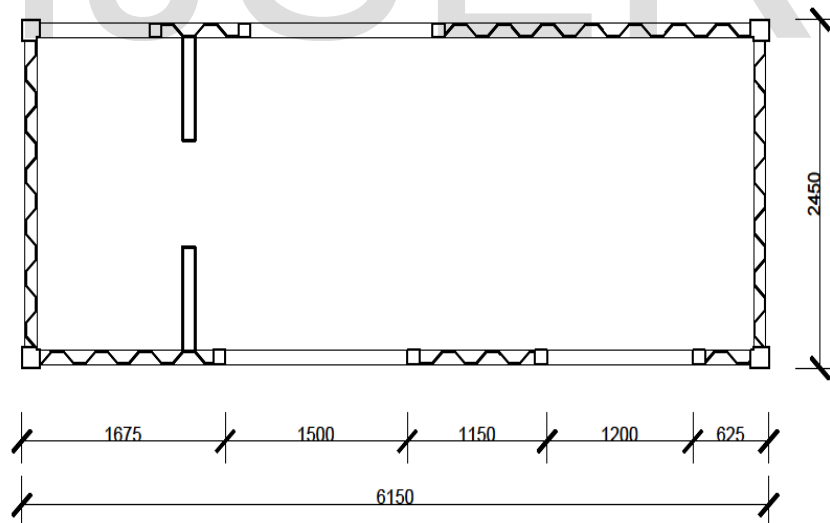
Floor Plan of the control unit showing the walls, internal partitioning and openings
